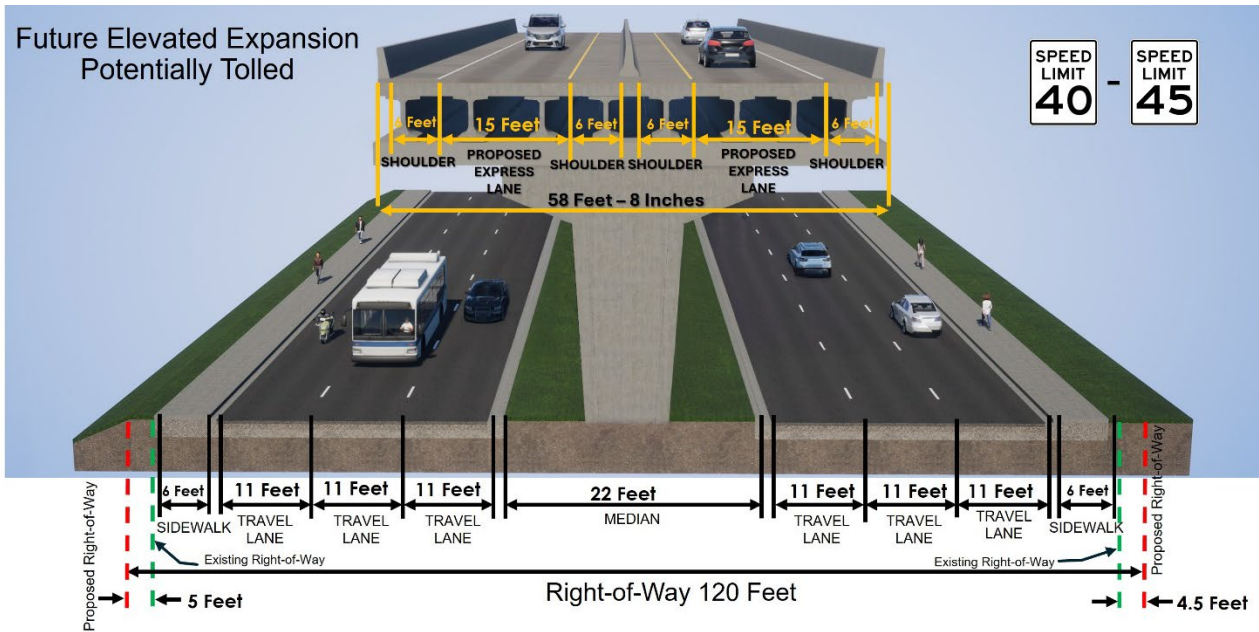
Preferred Alternative South of Desoto Bridge
